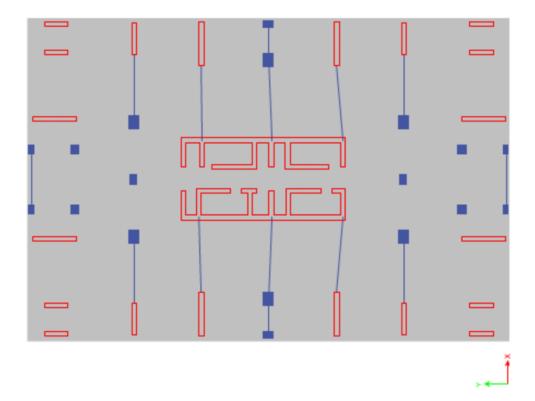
Final offices floor plan (Sample: 20th office's floor)
